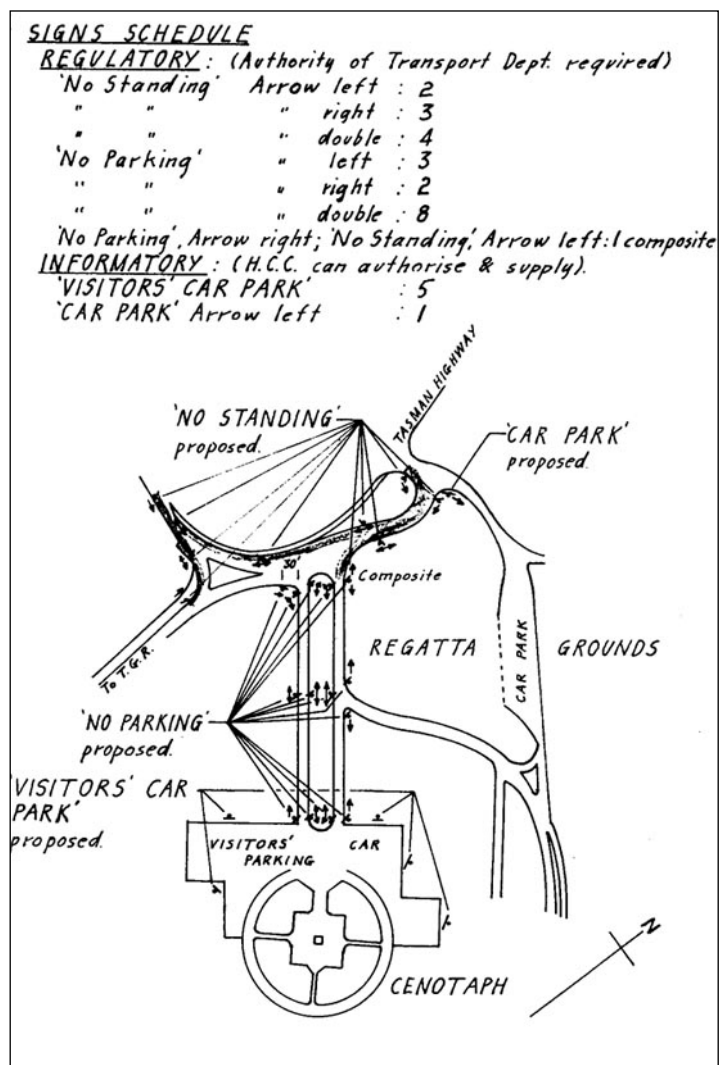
1969 plan showing the surrounds of the Cenotaph and proposed road and carparking changes (AOT—MCC16/2/371).
